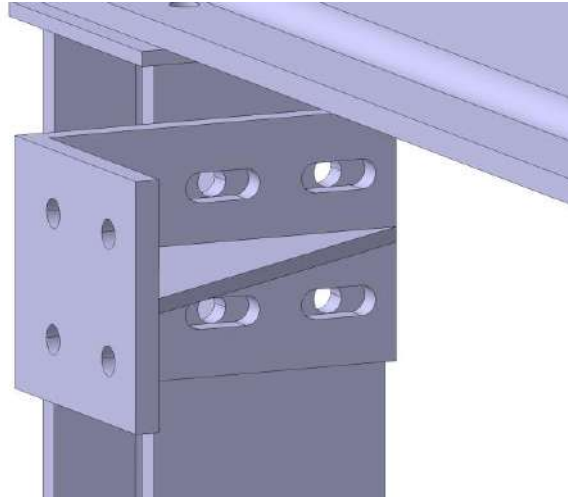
The proposed L-shaped bracket that connects two feet of the false floor structure to the concrete wall of the CV room.
